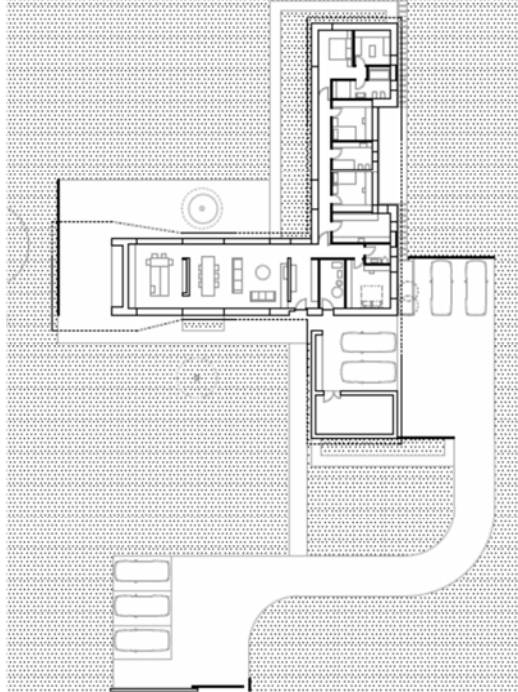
House in the poplar. To reduce the visual impact of the new building, the project include a T-shaped floor plan, allowing for a better orientation of the rooms. The house is characterized by a deep continuity between the internal and the external spaces and the generous natural lighting characterize the interior spaces.
